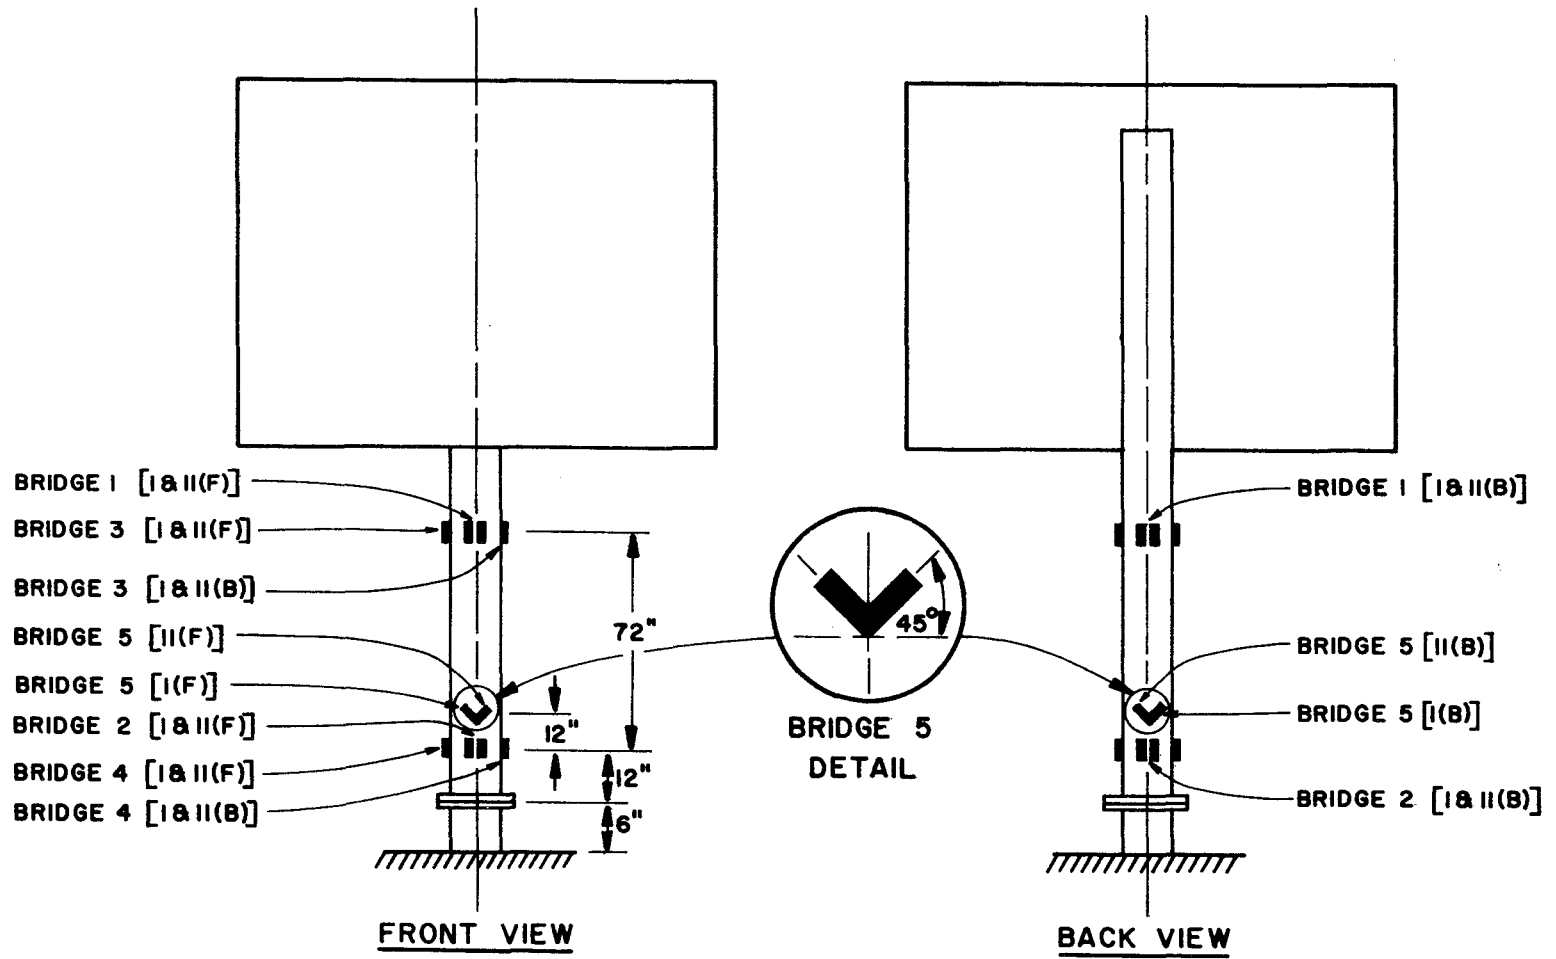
LOCATION OF STRAIN GAGE BRIDGES ON FULL-SCALE SIGN
